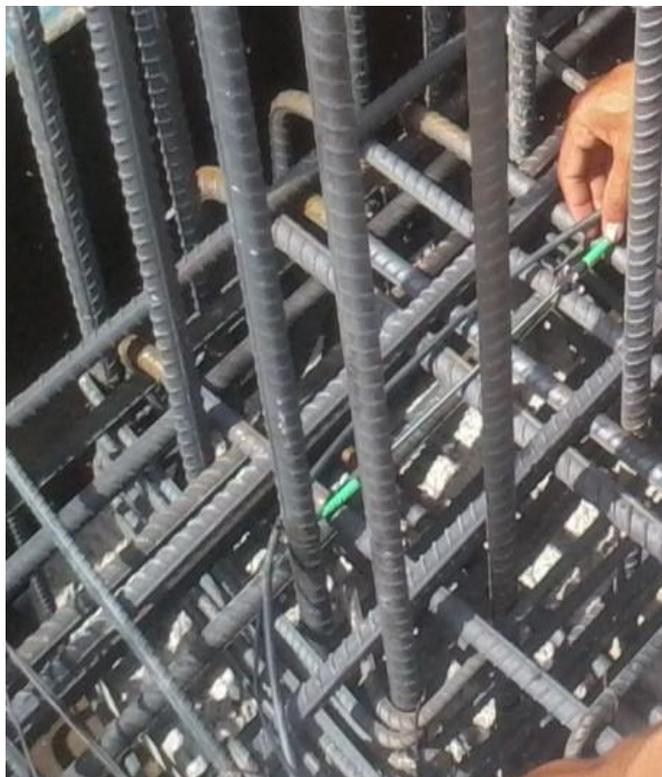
Installation of FBG sensor in a typical steel reinforced concrete structure
